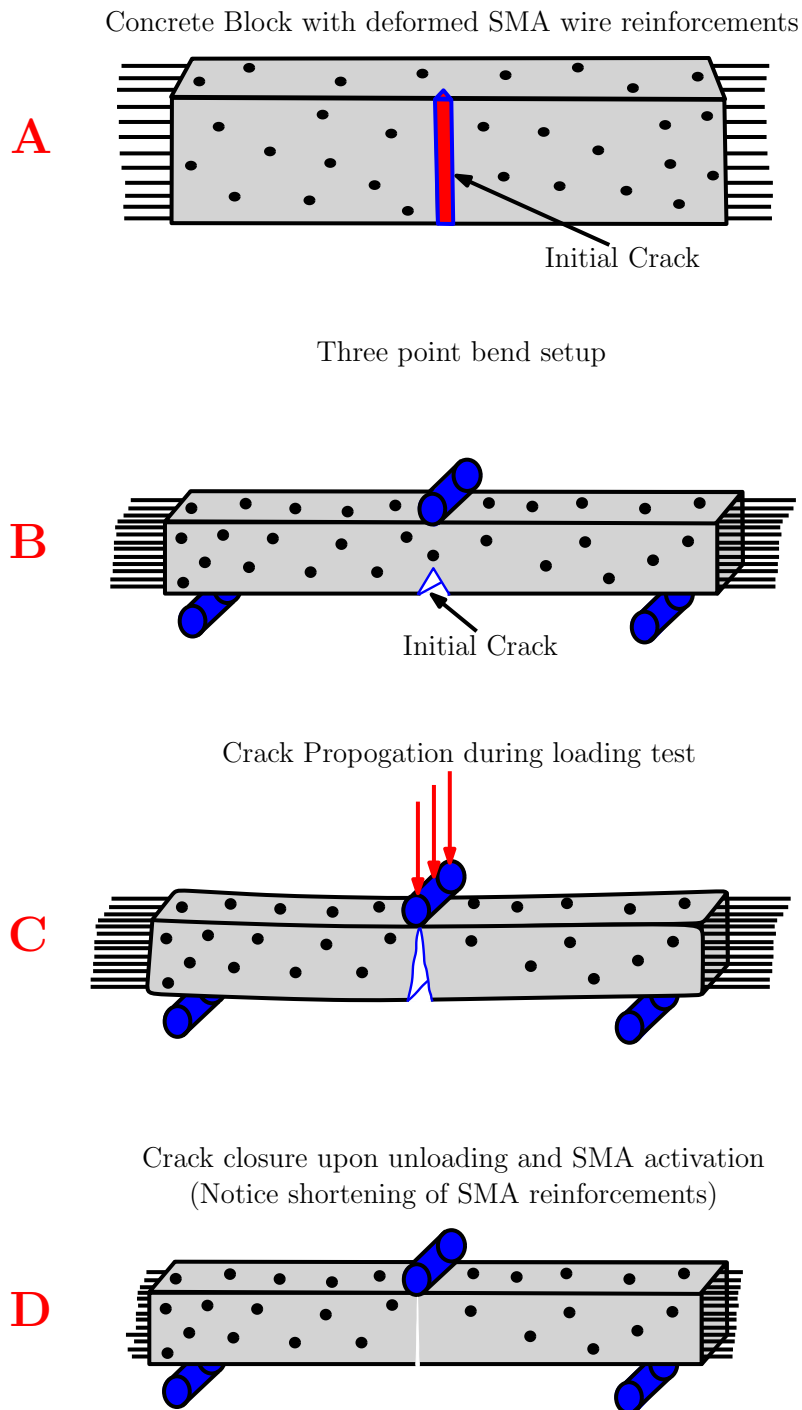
(A) - Some pretensioned SMA reinforcements in a concrete block with an initial crack. (B) shows a classic 3-point bend setup. (C) shows the crack propagation during loading. (D) shows the crack closure upon unloading and activating (heating) SMA reinforcements. The SMA wires shorten causing the crack to close (figures adapted from [20, 49]).
